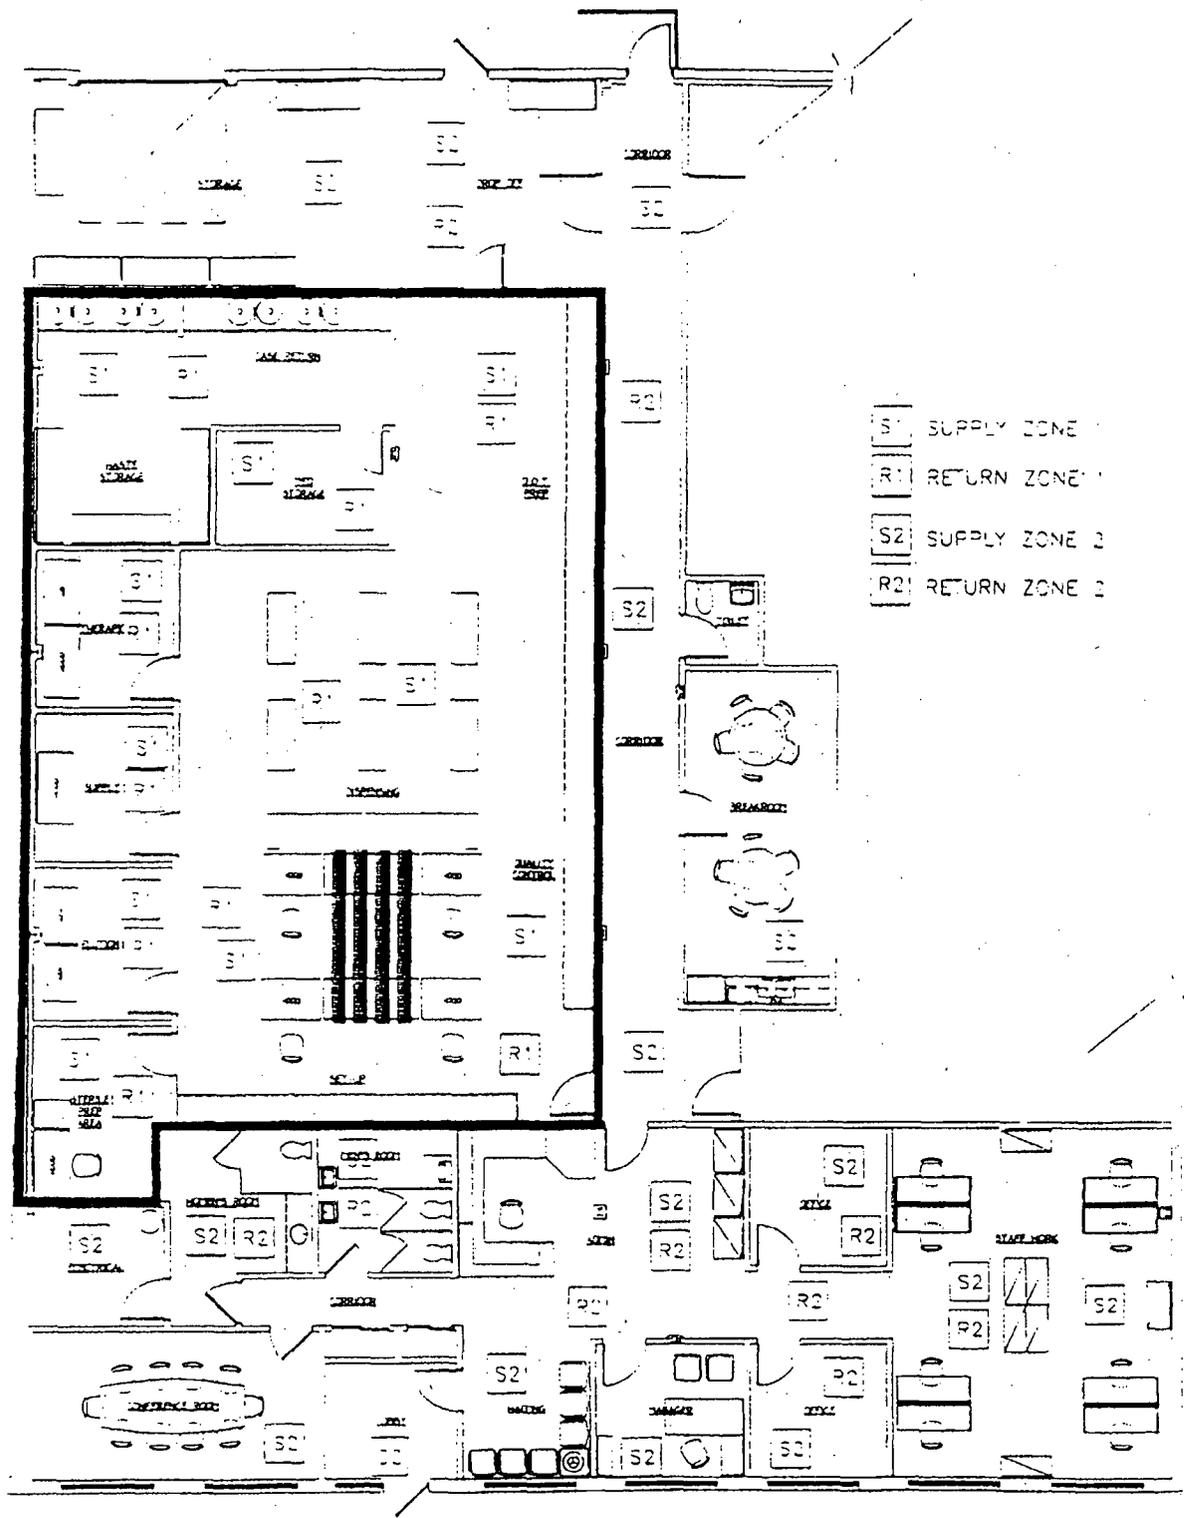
Facility Floor Plan. The restricted area is outlined in black.
